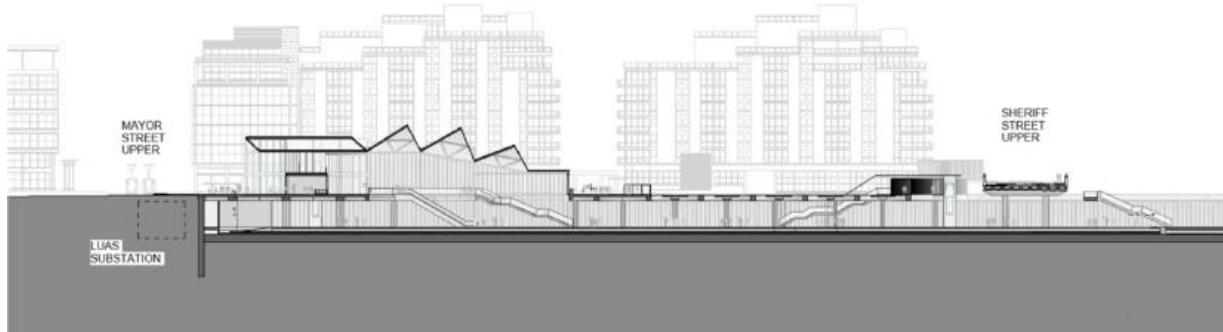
Schematic cross section of proposed Spencer Dock Station
